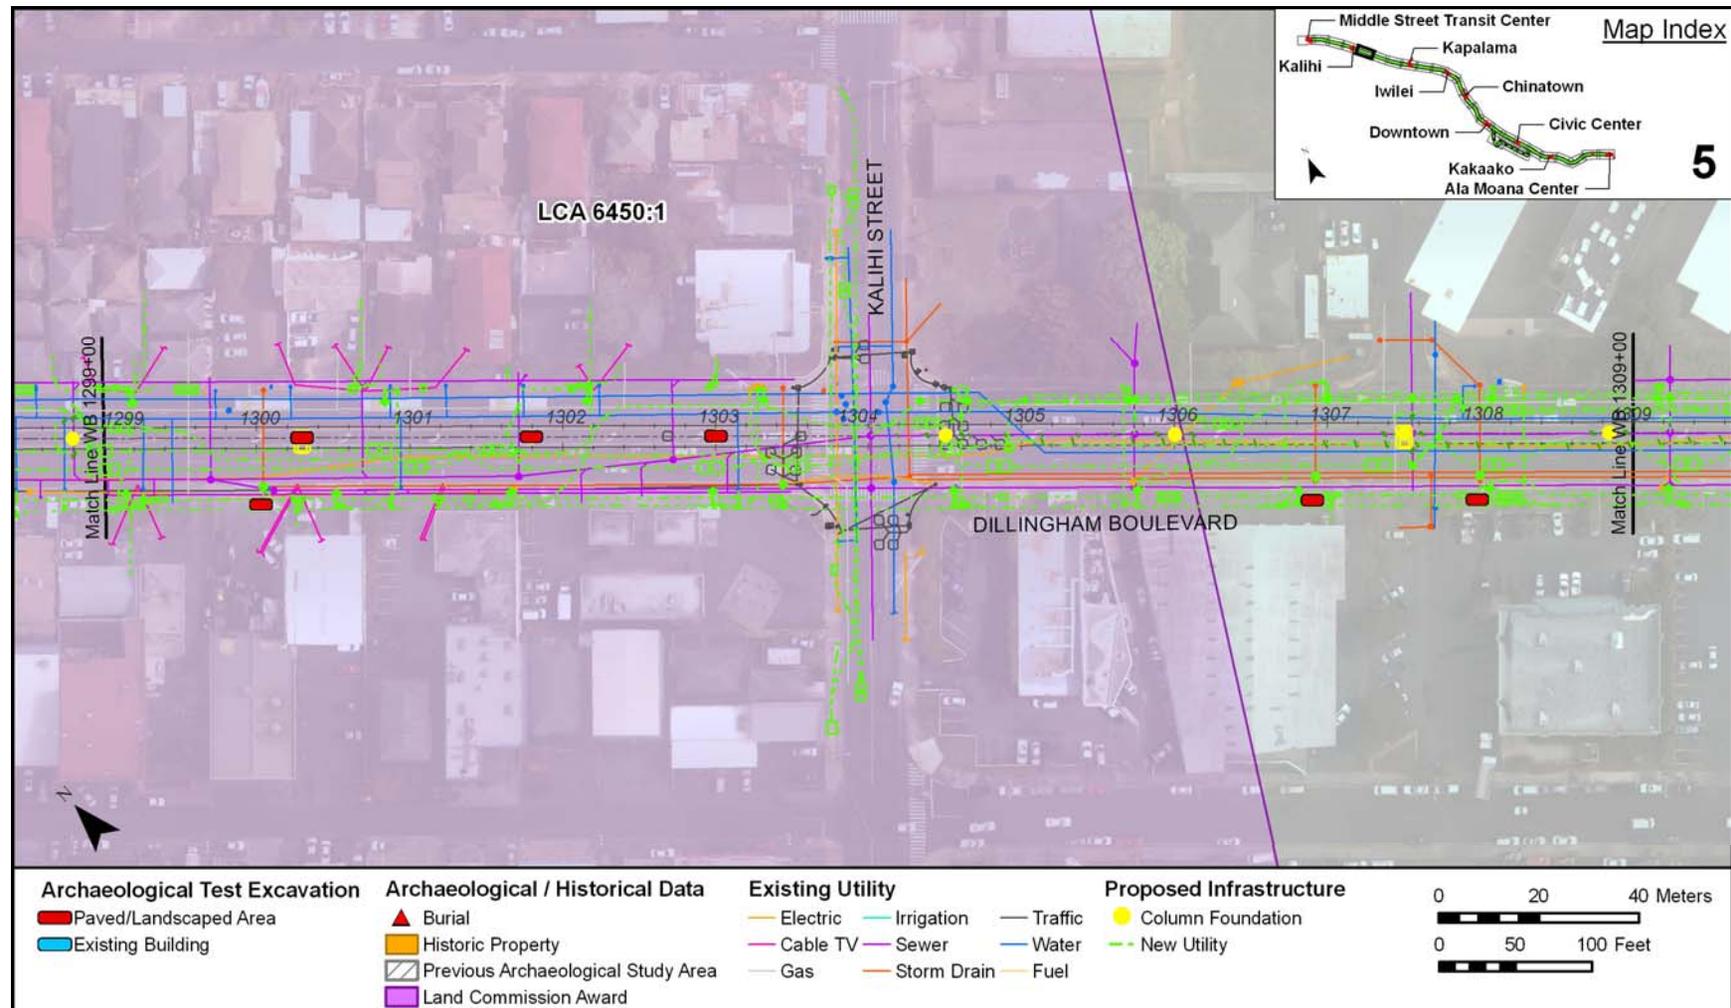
Map 5 (Dillingham Boulevard near Kalihi Street) showing proposed locations for archaeological inventory survey testing including (from west to east) a 3' by 10' trench at a storm drain catch basin at WB 1300+10; a 3' by 10' trench at column foundations at WB 1300+30, WB 1301+80, and WB 1303+00; and a 3' by 10' trench at storm drain catch basins at WB 1306+90 and WB 1308+00
